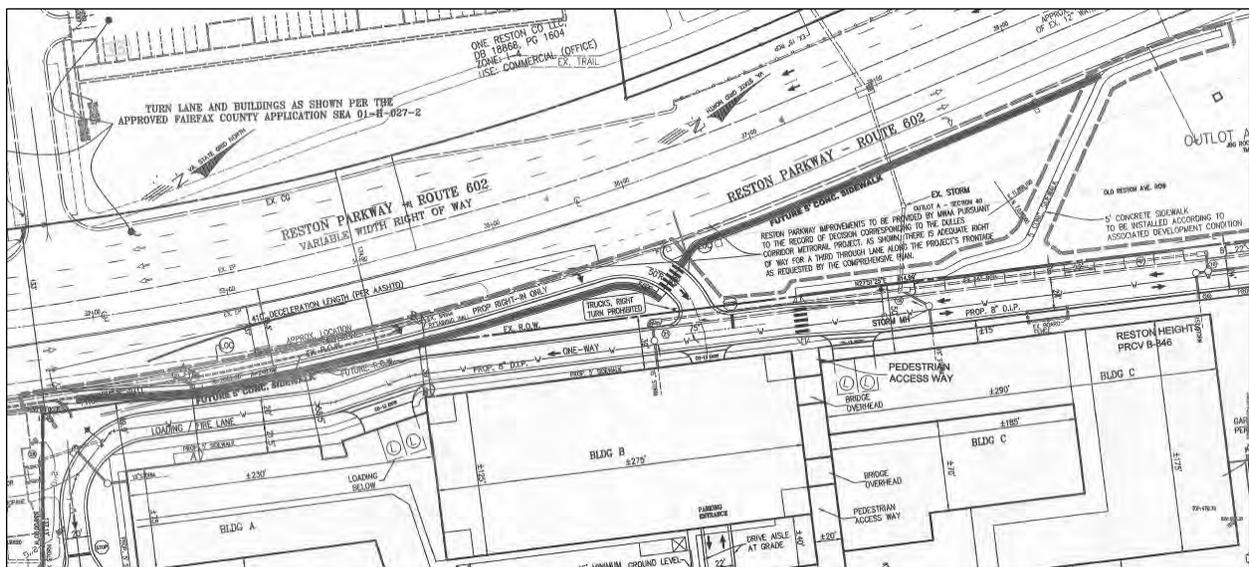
The dark line shows a conceptual location for the RMAG sidewalk (Source: Urban, Ltd.)
